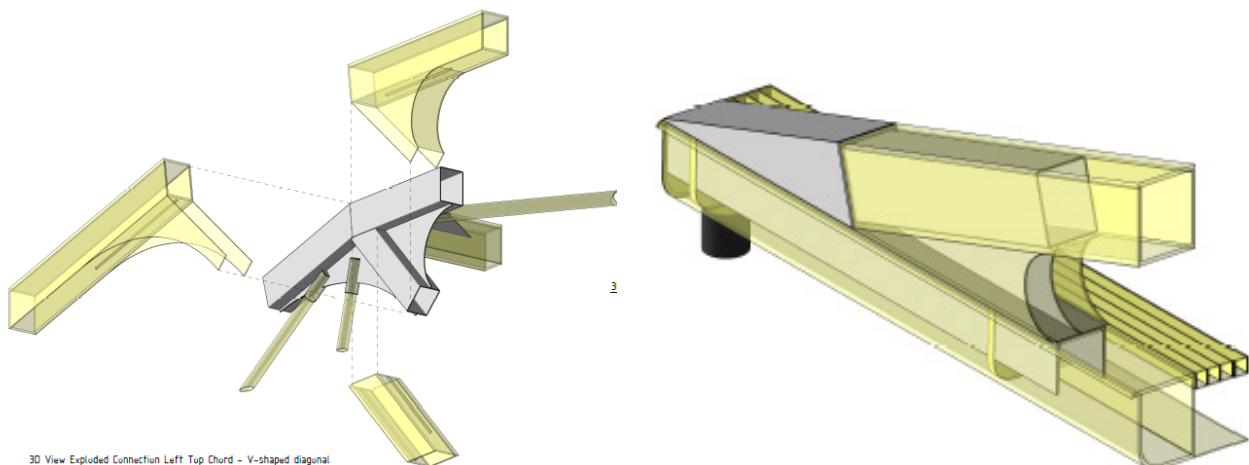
3D view of the connections at the bridge deck with its steel insert (upper picture) and the connections at the top of the bridges' truss with steel inserts for easier assembly. [Haskoning, 2015]
